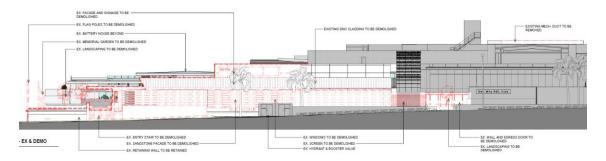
Proposed demolition on western elevation (Pittwater Road) (Source: Altis Architecture)
